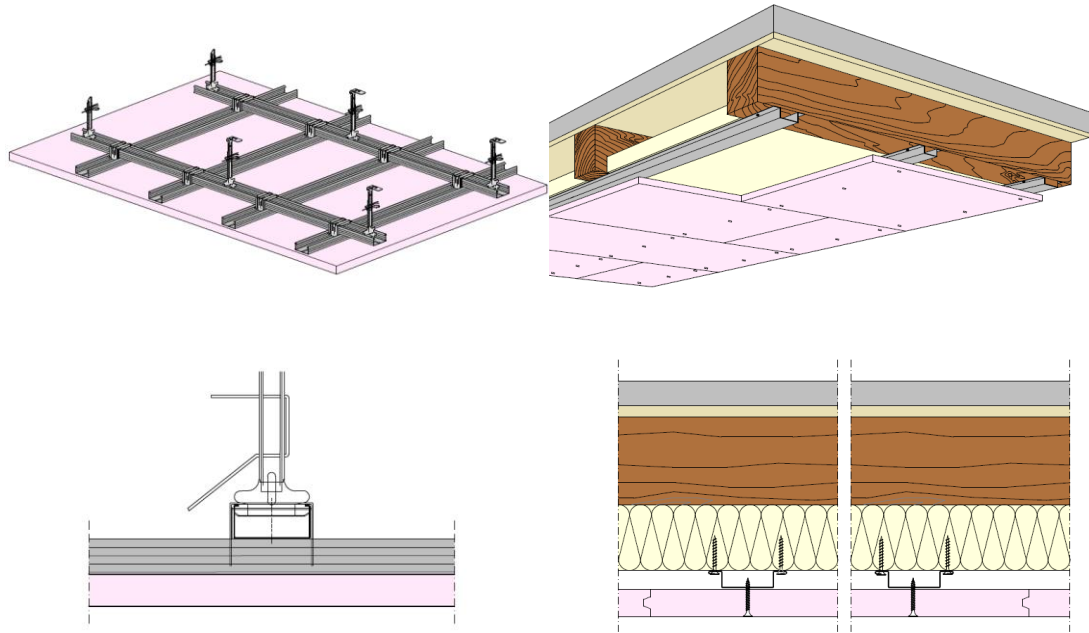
PCM plasterboard details for two different ceiling systems - (a) suspended ceiling (b) timber frame. Extracted from Rigips AG (2015).
